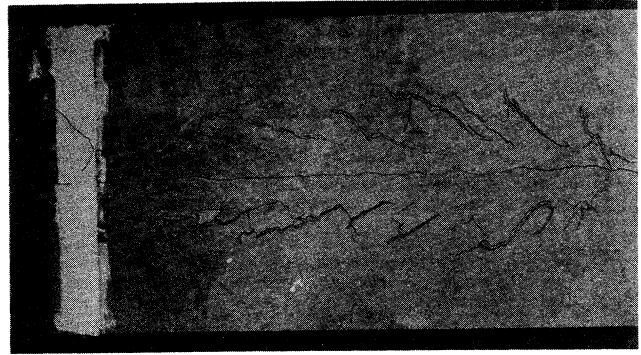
Top view of slab in Beam 41a, showing the herringbone cracking in the concrete. Such cracking did not prevent the beam from surpassing its calculated capacity.
